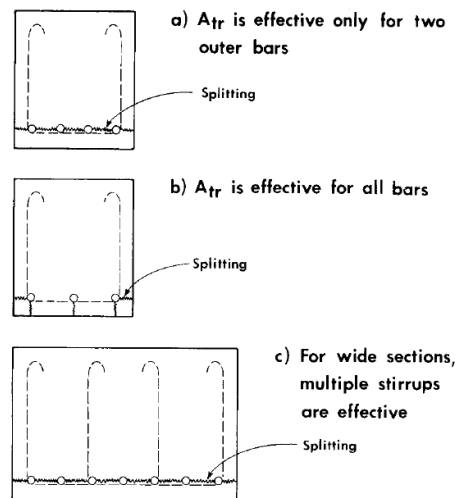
examples transverse reinforcement interaction with splitting cracks (Jirsa et al. 1979).
